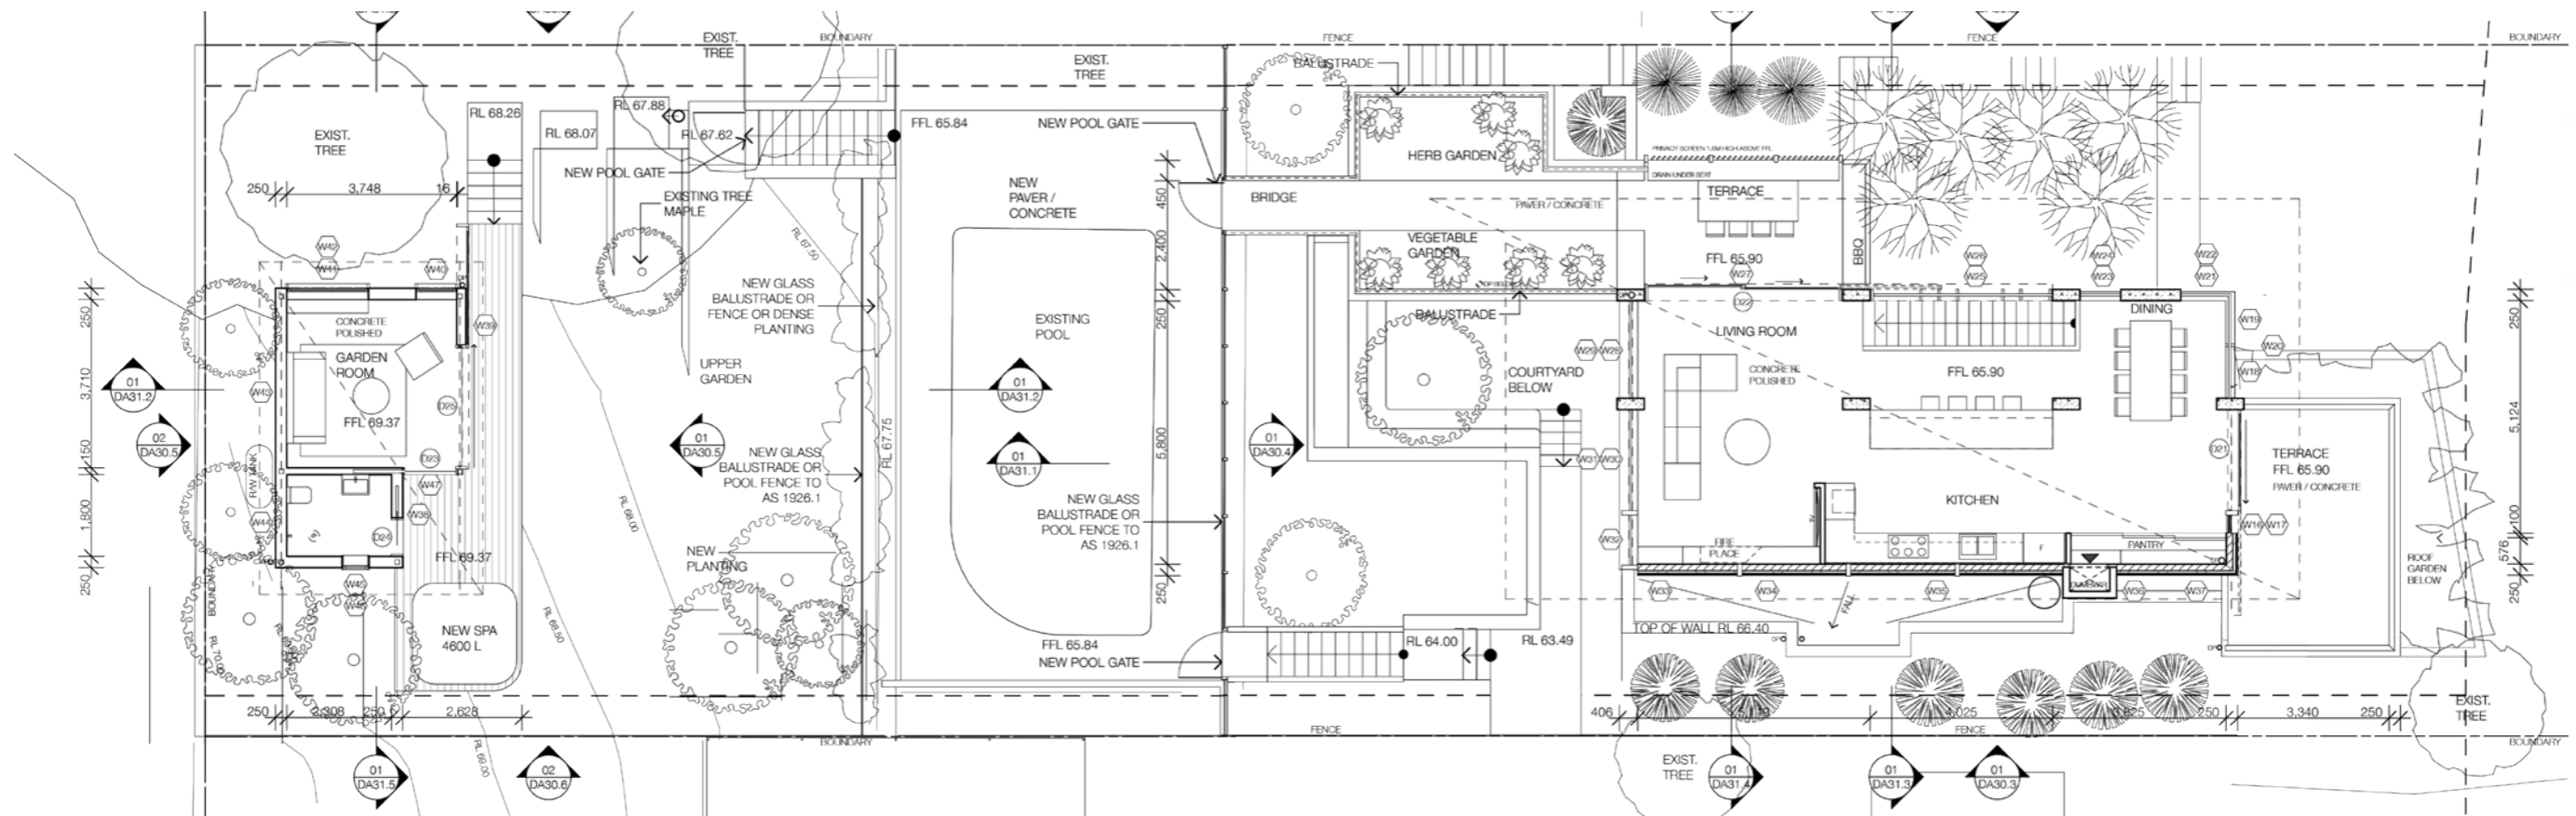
## DETAILED SUBMISSION FOR DA APPROVAL - PLANS
